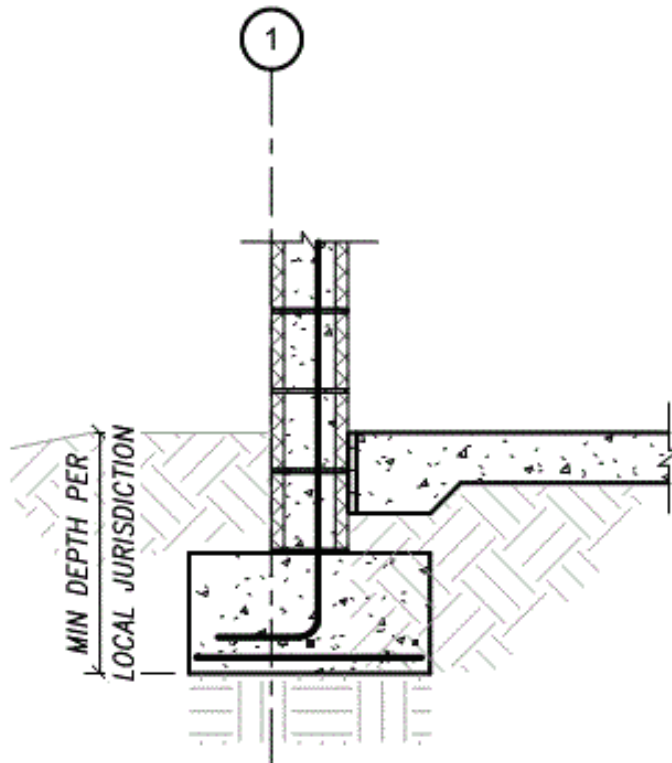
Single-story retail/industrial/warehouse building foundation detail.
